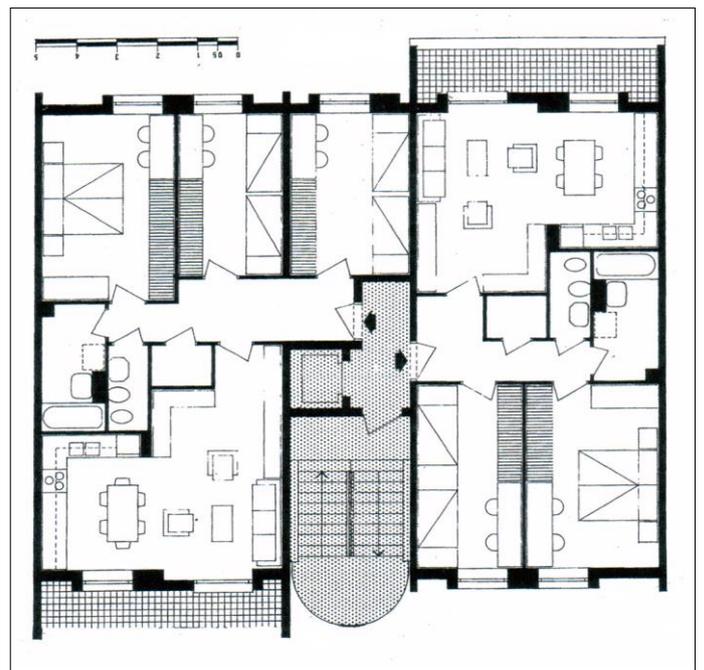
Coffrage-tunnel process. PEEP E 14 quarter, via Reiss Romoli. Plan of the standard stairwell / Procedimento *coffrage-tunnel*. Quartiere PEEP E 14, via Reiss Romoli. Pianta blocco scala tipo (ALSBC, Fondo Co-Ar, CEDV).
